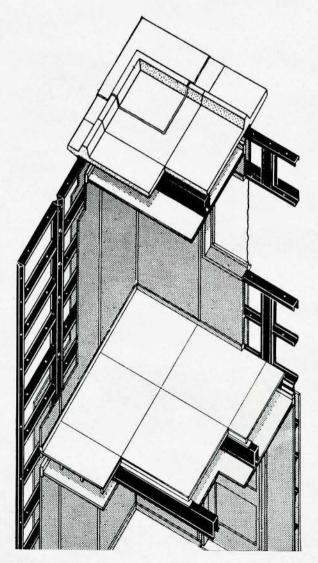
Axonometric Drawing showing the Braithwaite Unit Construction System — The system employs a grid dimension of 3'-2".
